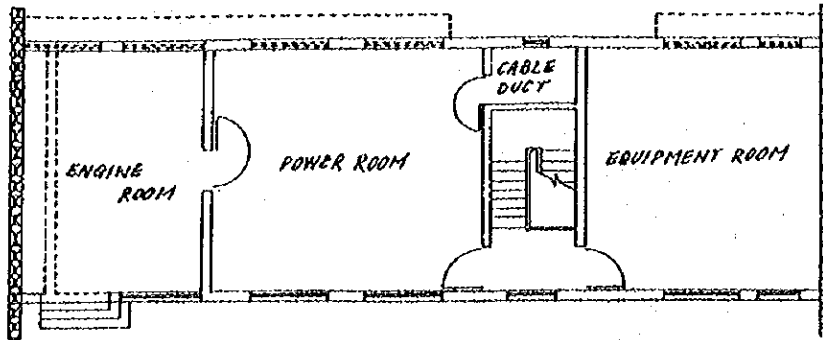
Plan (2nd Story) of Type O Radio Repeater Station
